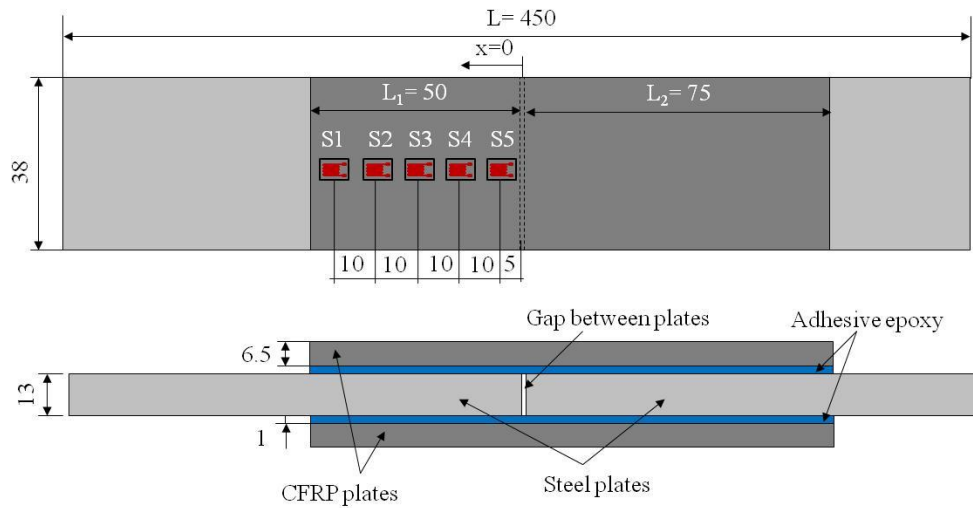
Schematic of the double lap shear specimen shown the dimension and the locations of strain gauges (All dimension in mm)
